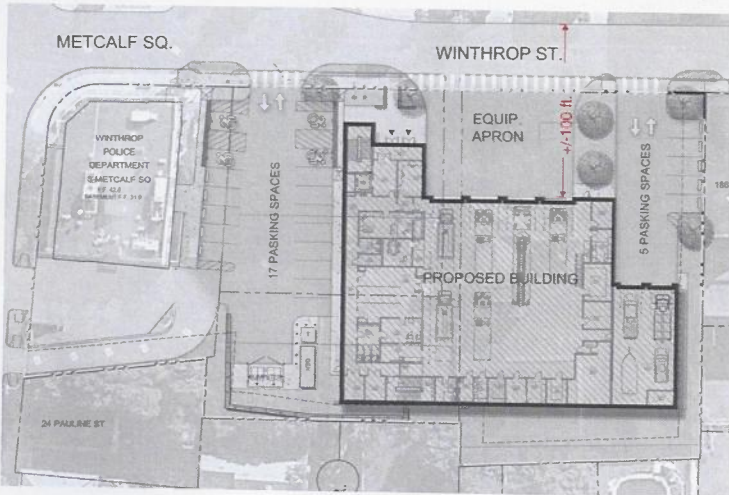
Proposed Equipment Apron buffer. Floor plan courtesy of Kaestle Boos Associates, Inc.
